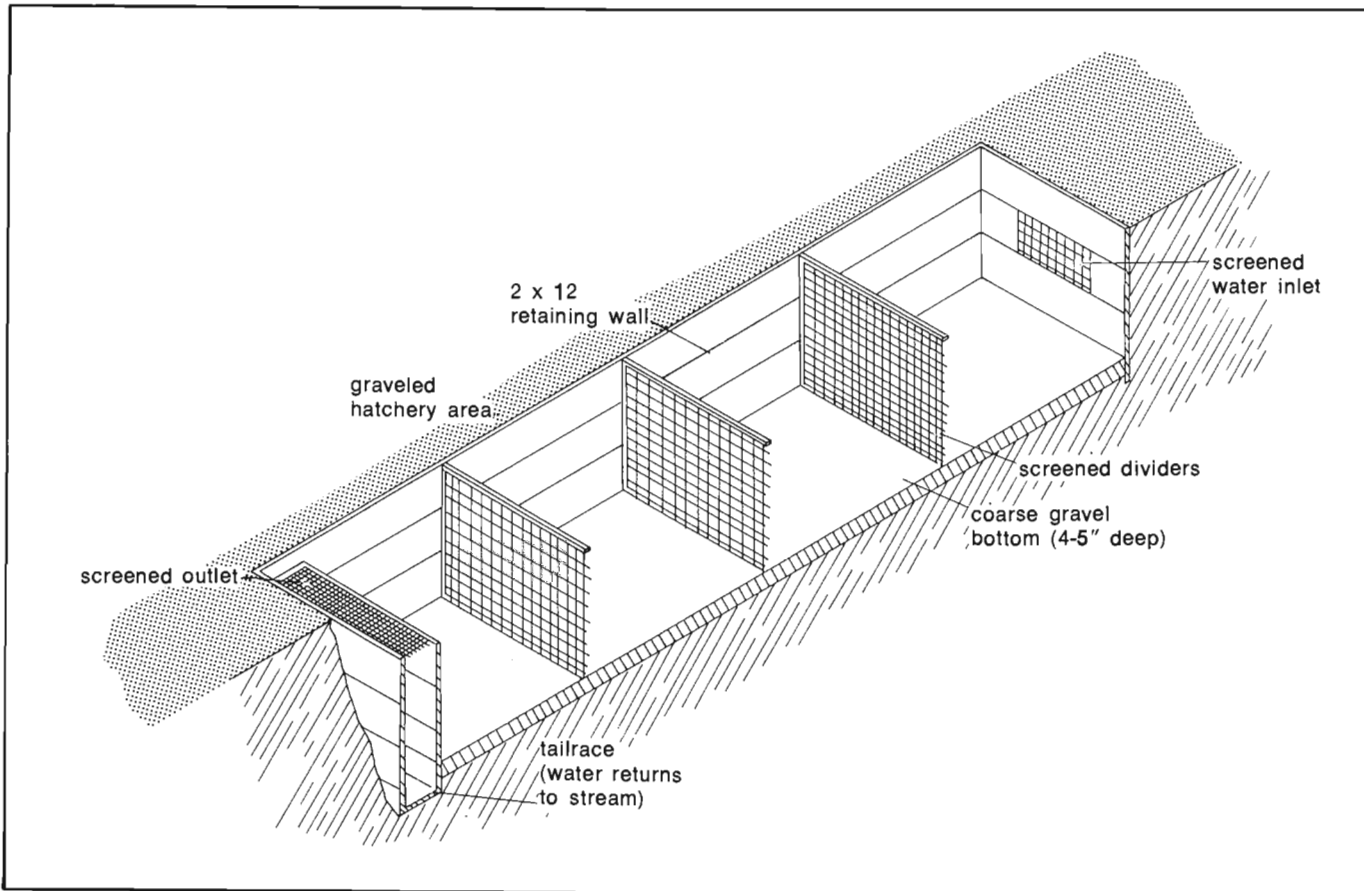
Adult holding raceway. Raceway is 20 feet long, 4 feet wide and 3 feet deep.
